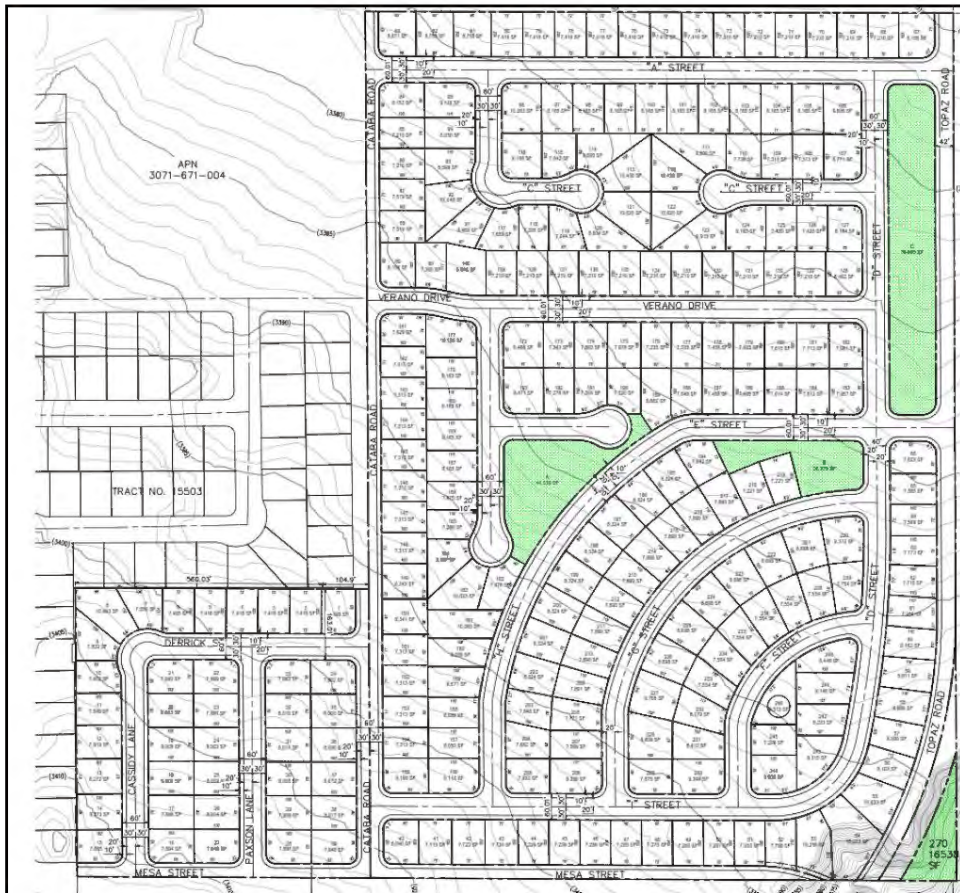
Site Plan – Proposed Housing Development - TTM 20576, Victorville, CA
